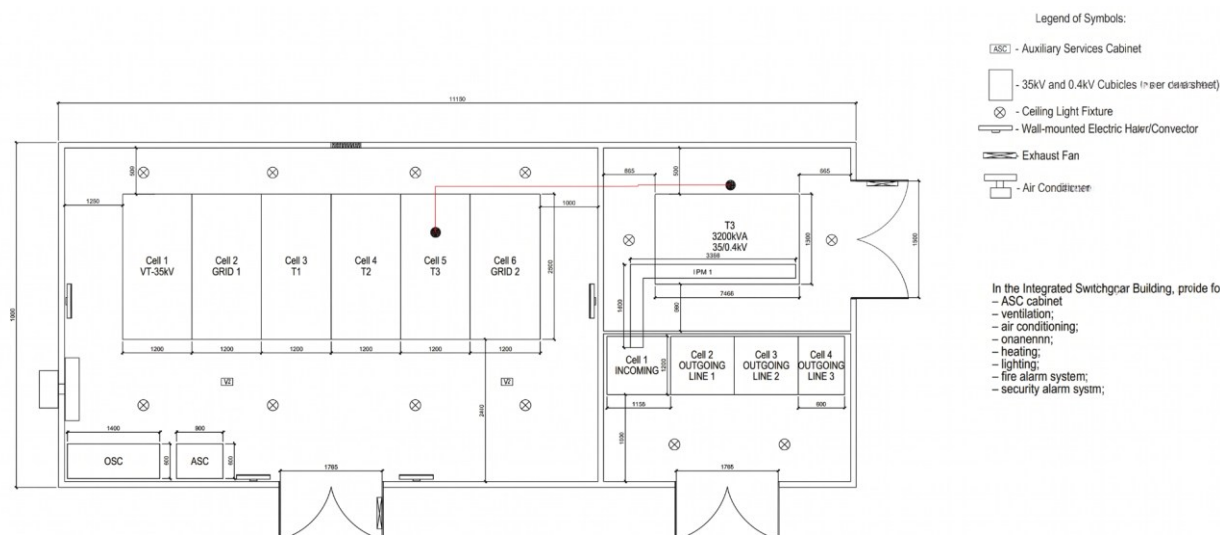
Floor Plan of the Electrical Distribution Room (Switchgear Layout)
